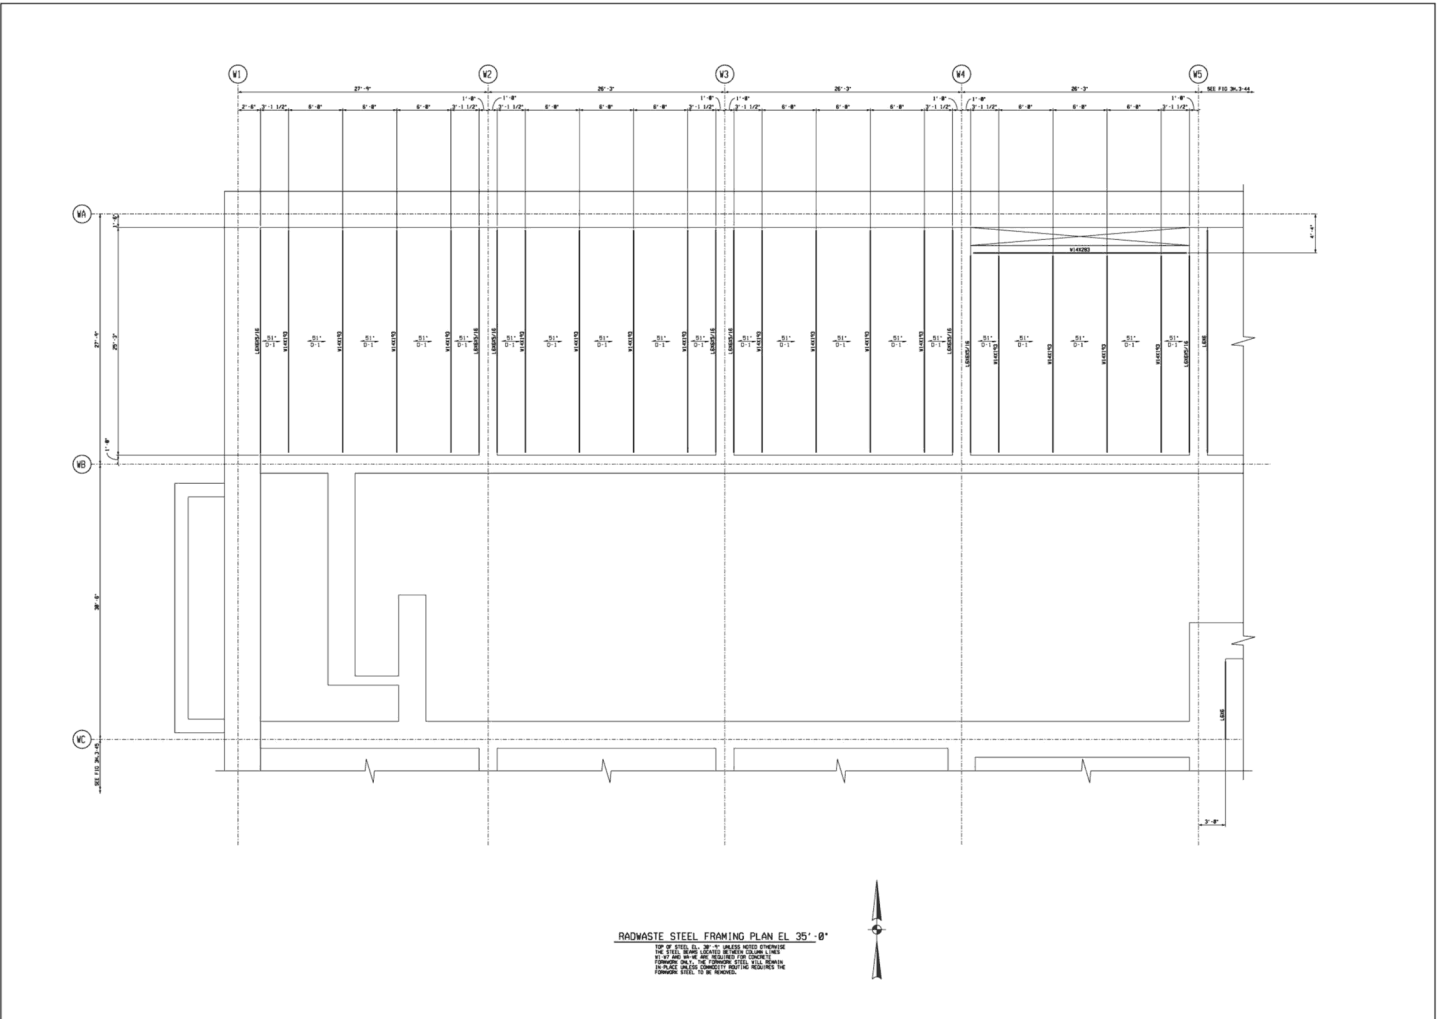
H.3-43 El 35'-0" Steel Layout Between Column Lines W1-W5 and WA-WC
